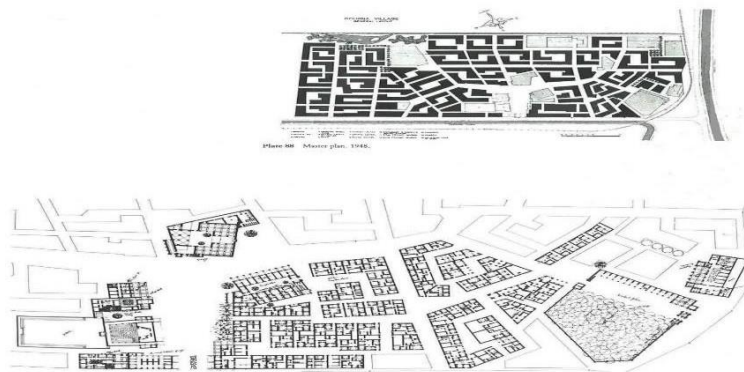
Fathy's New Gournia Masterplan (up) and Ground floor plan (Url-4)
